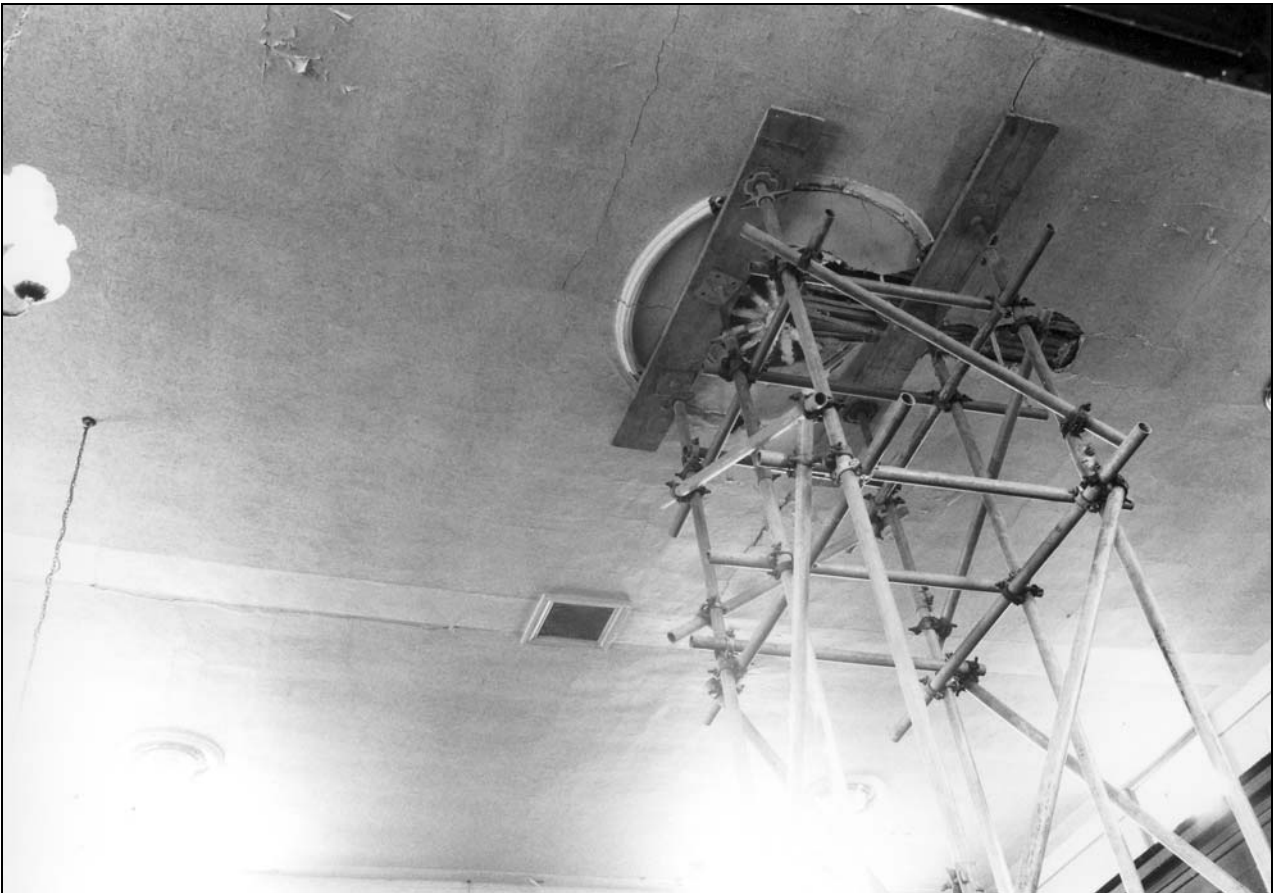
View of ceiling, looking south-east (film 4, frame 7)
